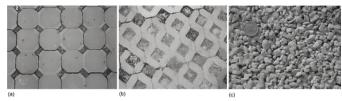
Photos that showcase the forms of permeable pavement used in the study. (a) Permeable interlocking concrete pavers, (b) concrete grid pavers, (c) porous concrete ⁷.
